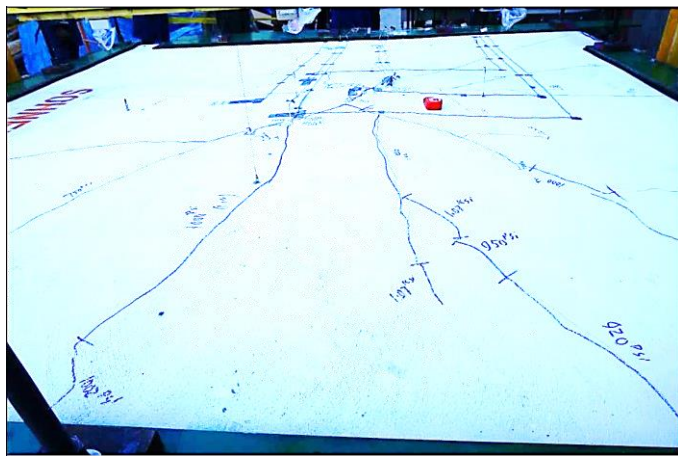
Cracks Pattern for Sandwich Slab Specimen C
